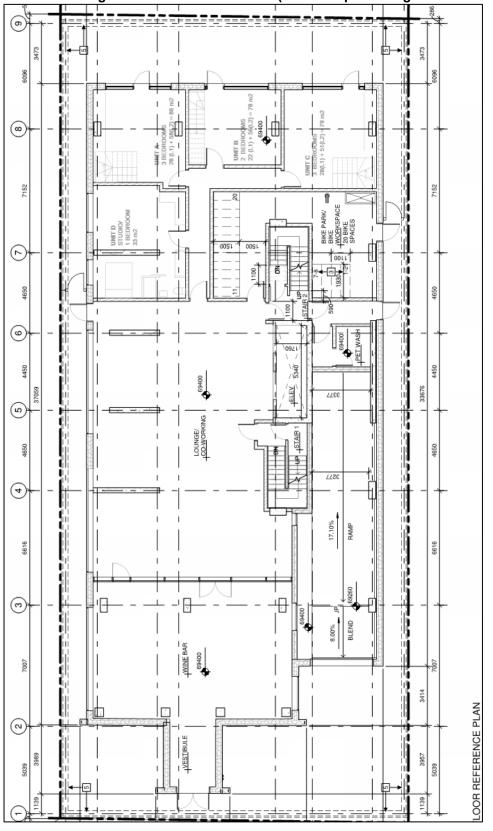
Ground Floor Plan. (Source: Spice Design and CSV Architects).
